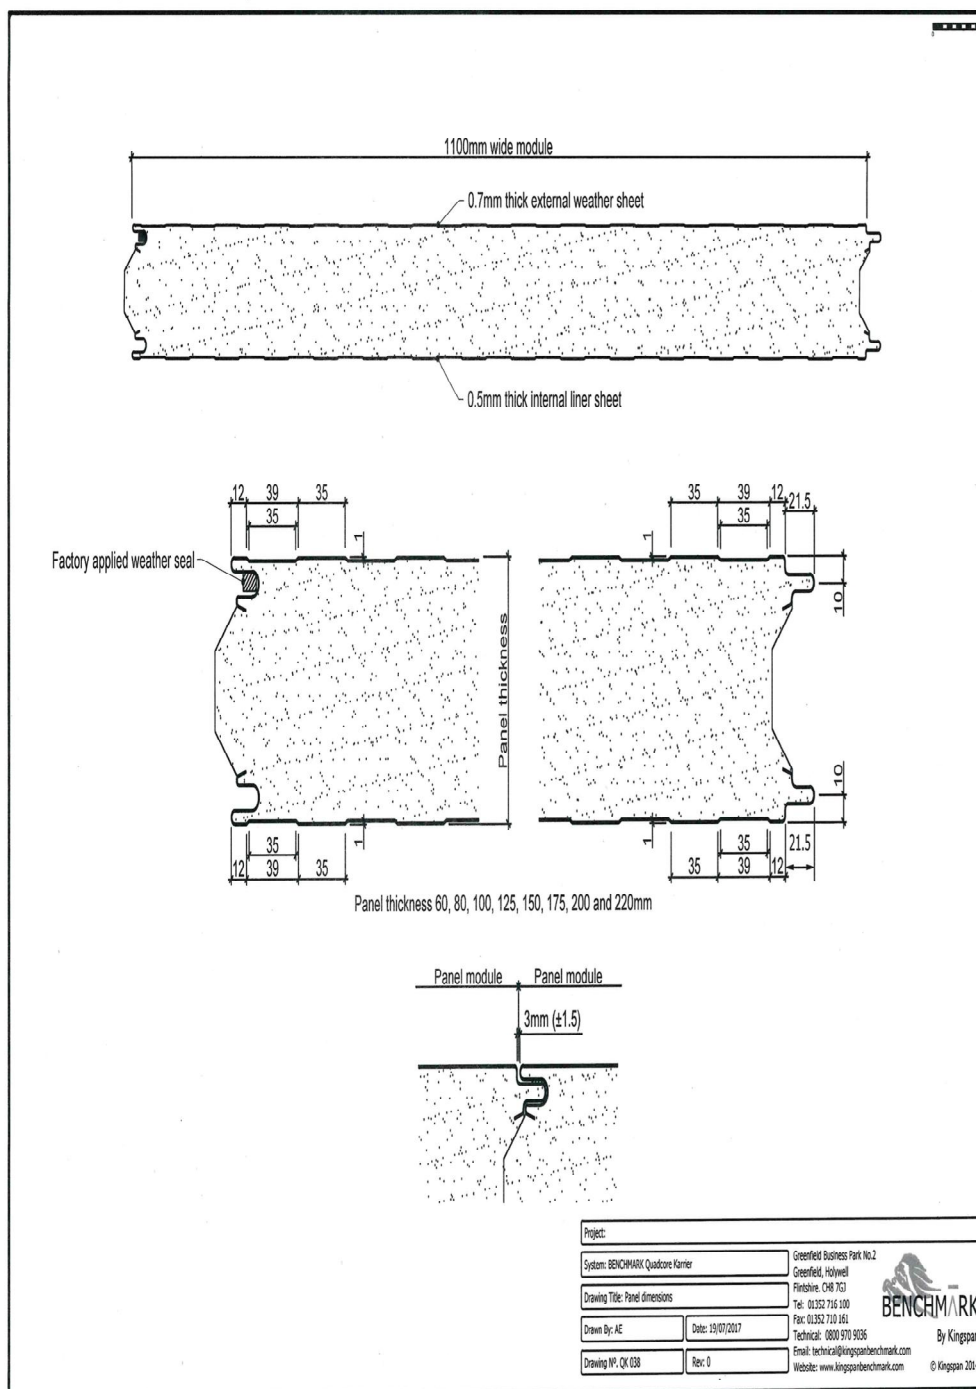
Client supplied drawing – Cross section of BENCHMARK QuadCore™ Karrier panel
